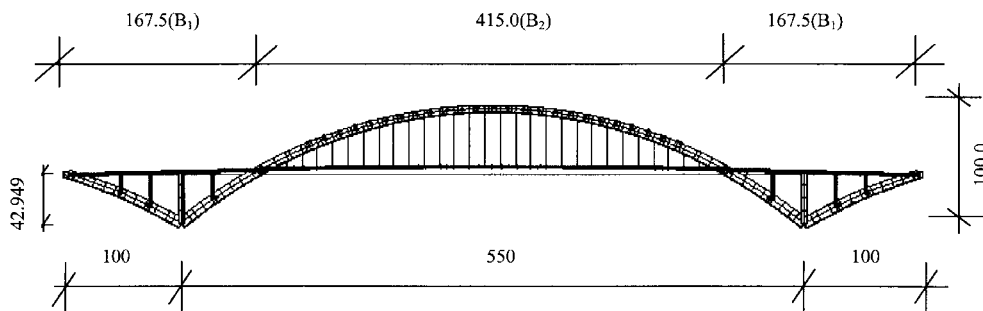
Elevation of Lupu Bridge (Unit: m)
